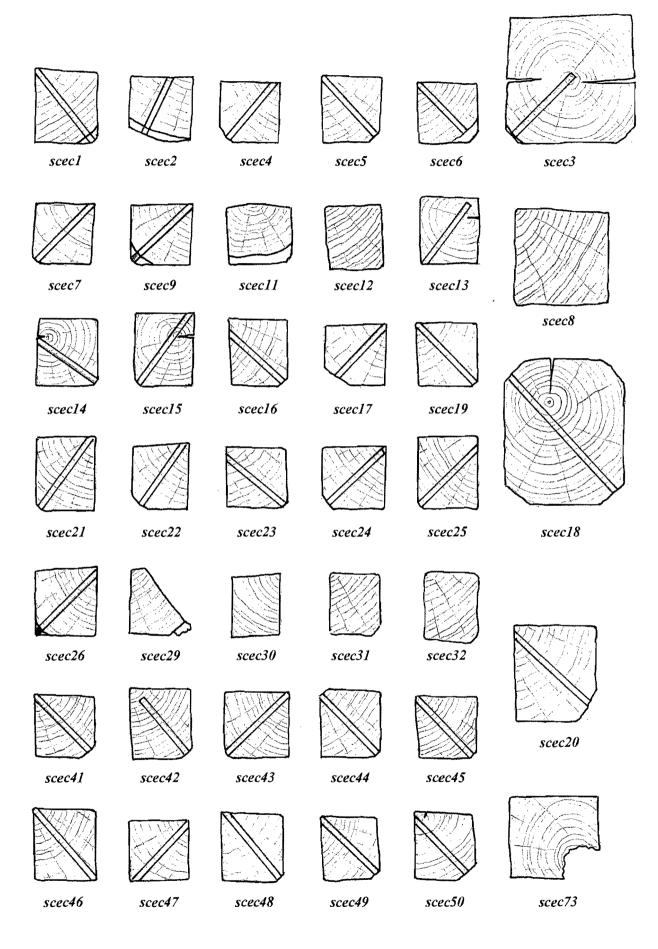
Scale section drawings of timbers sampled (scale 1:8)
